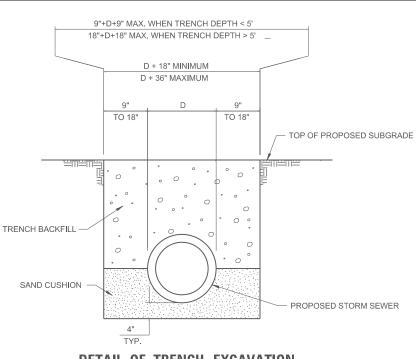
DETAIL OF TRENCH EXCAVATION AND BACKFILL UNDER TURF
